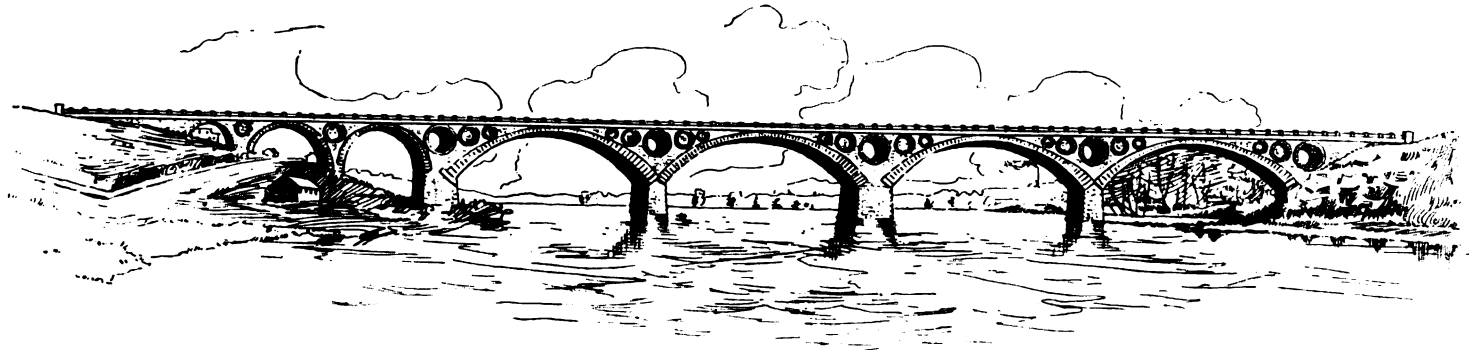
KNOXVILLE STONE BRIDGE DESIGN.
